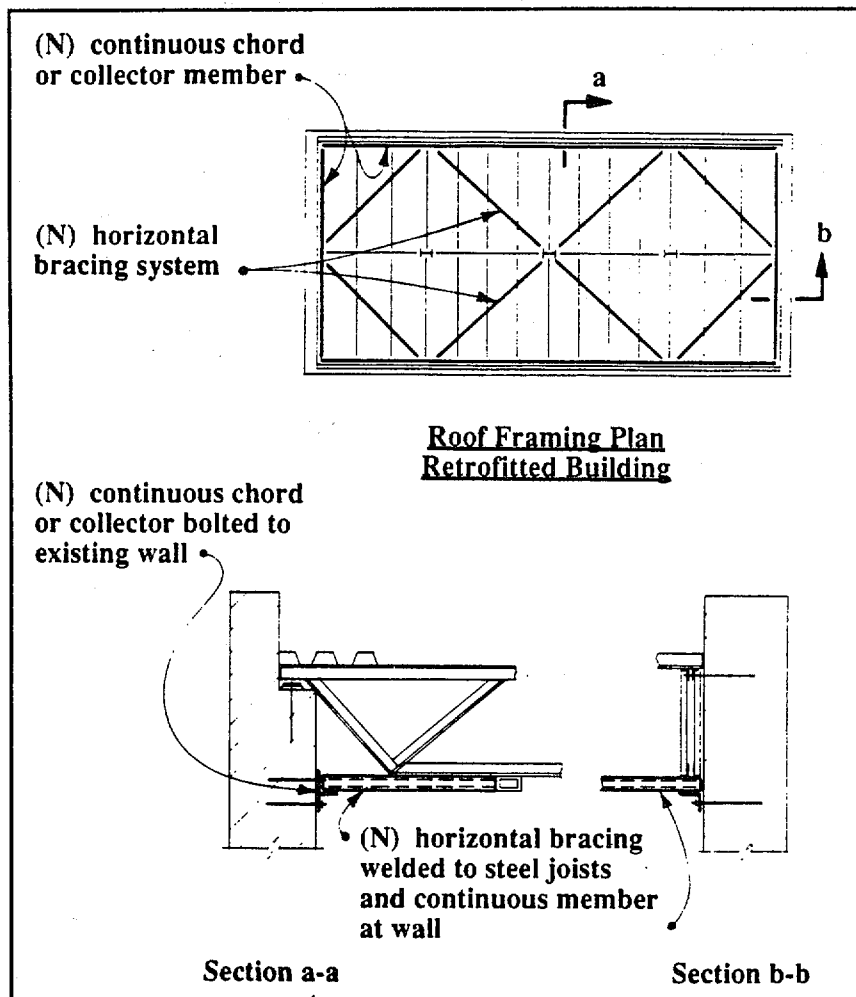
Strengthening an existing building with steel decking and concrete or masonry walls.
